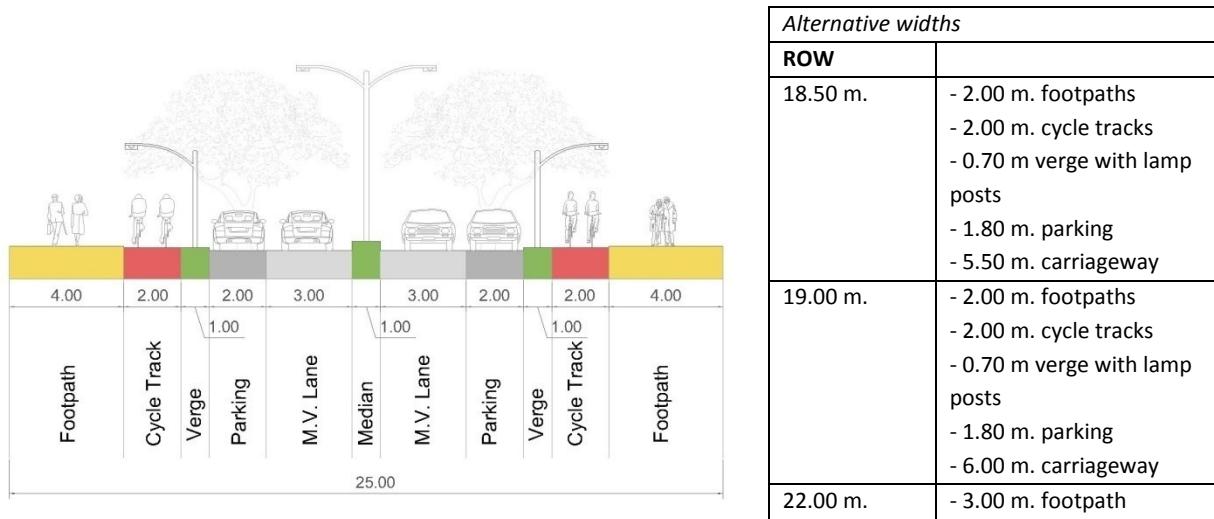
Wide collector road (21.50-25.00 m) at road sections (away from the intersection)
